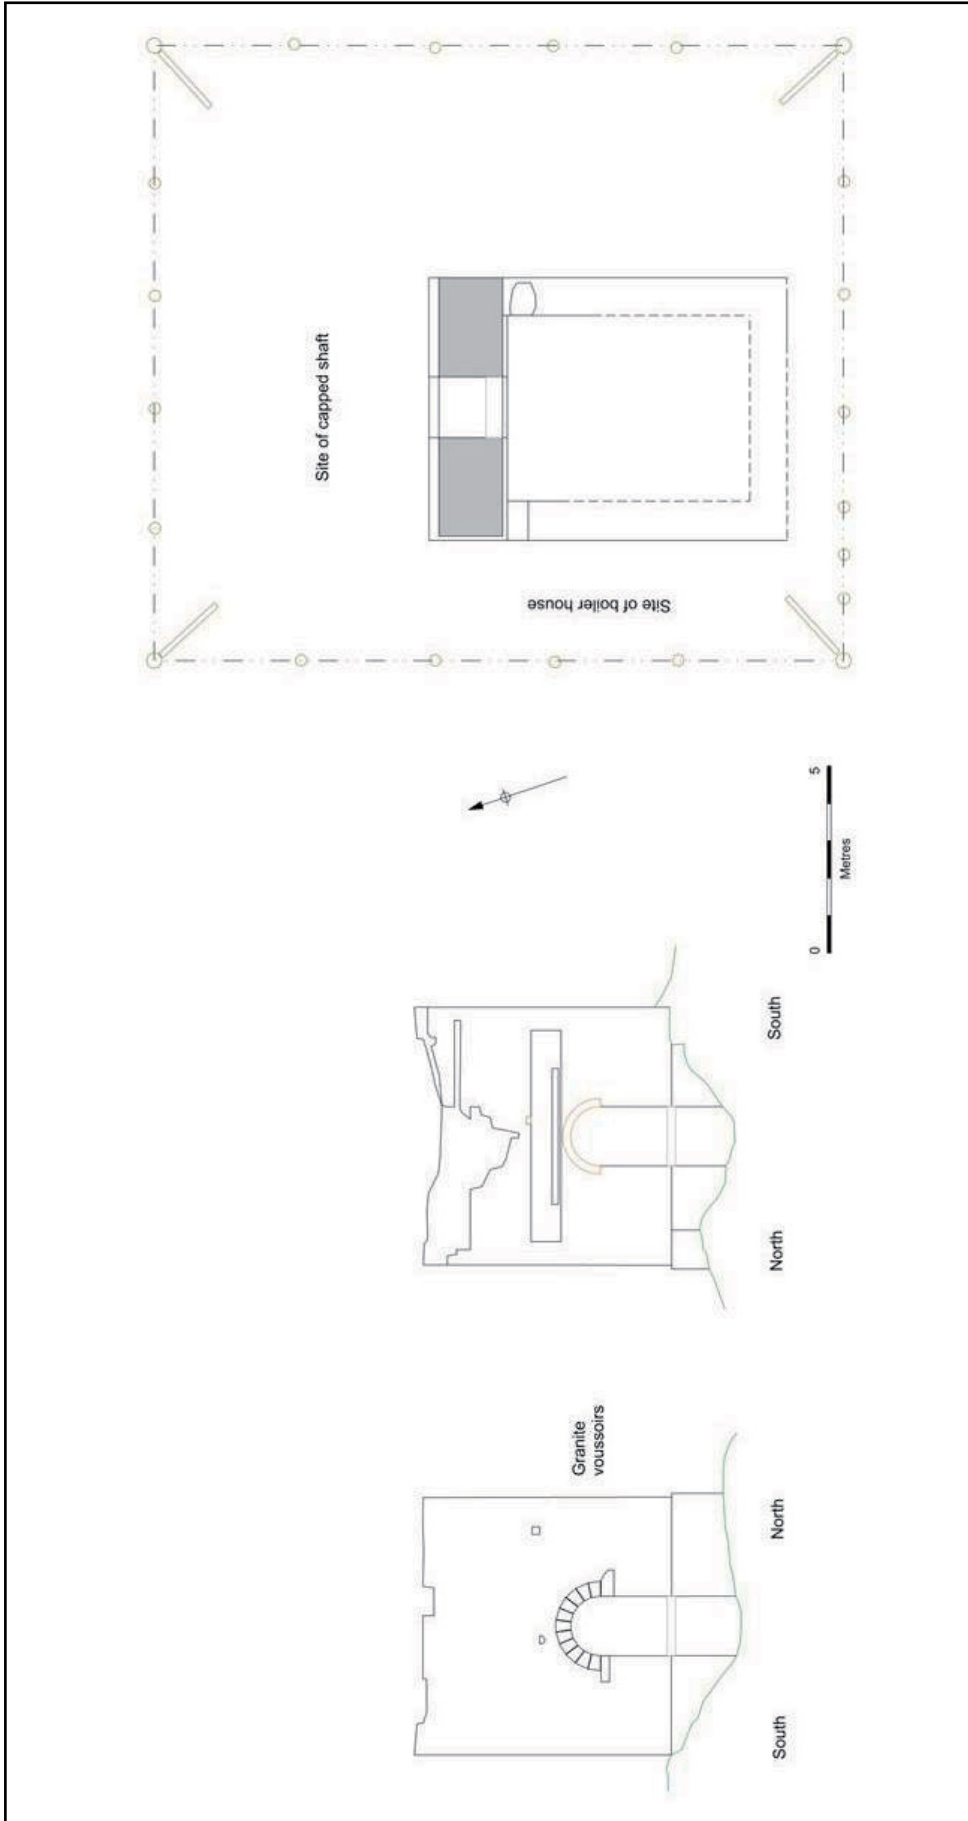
Plan and principal elevations of Great Wheal Charlotte pumping engine house [190567].
